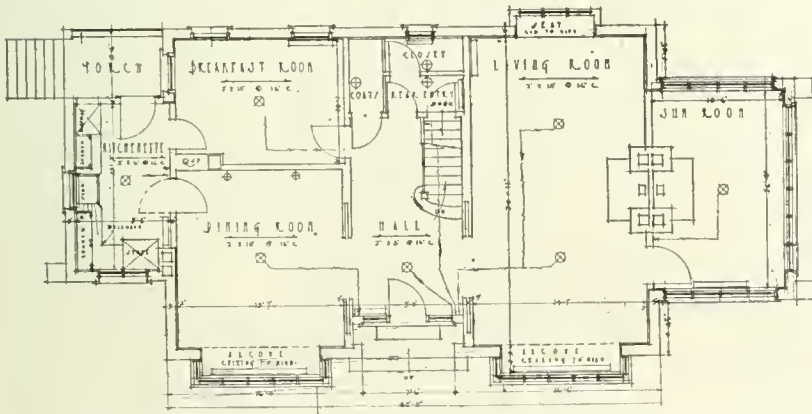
Ground floor plan of house shown in Fig. 9.
